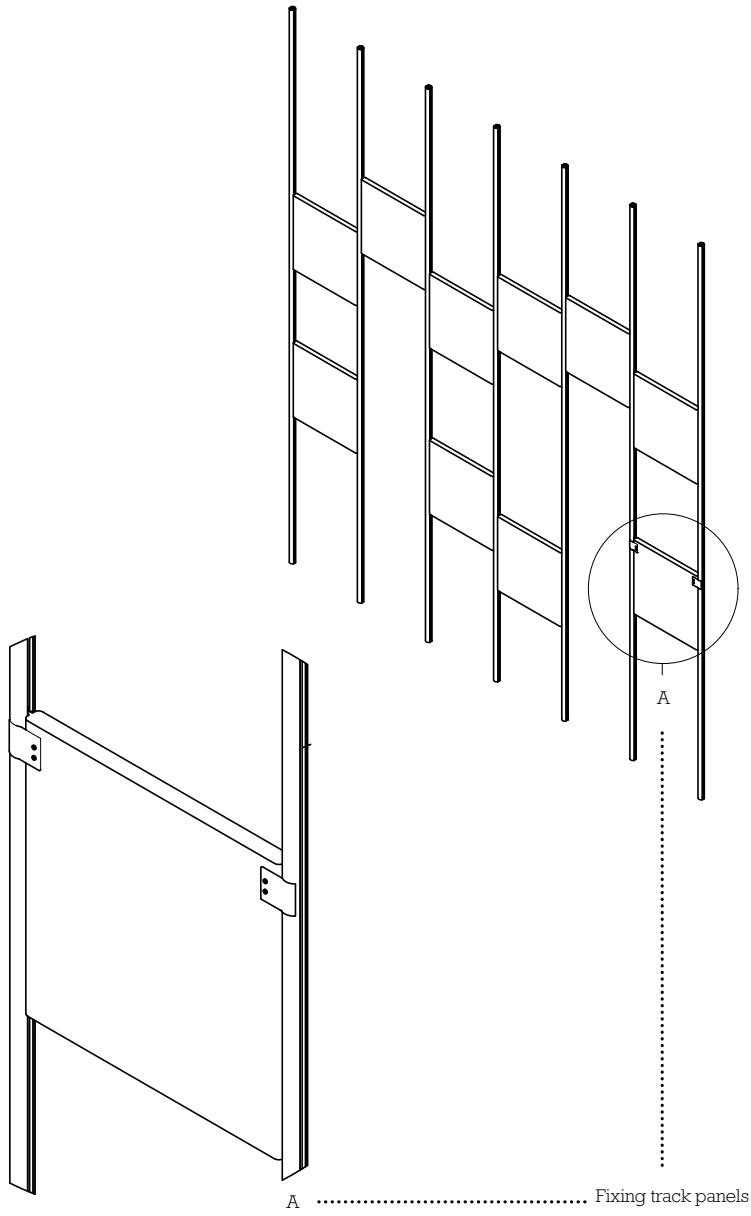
Construction detail - Modular outfitting system and single component focus | Axonometric views.
